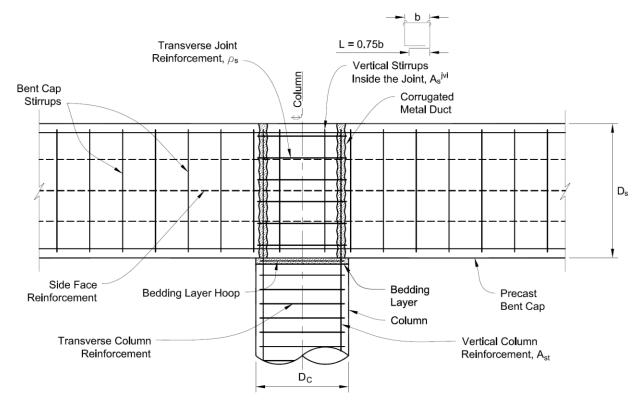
Grouted Duct Joint Shear Reinforcement Details (Elevation)—SDC A
